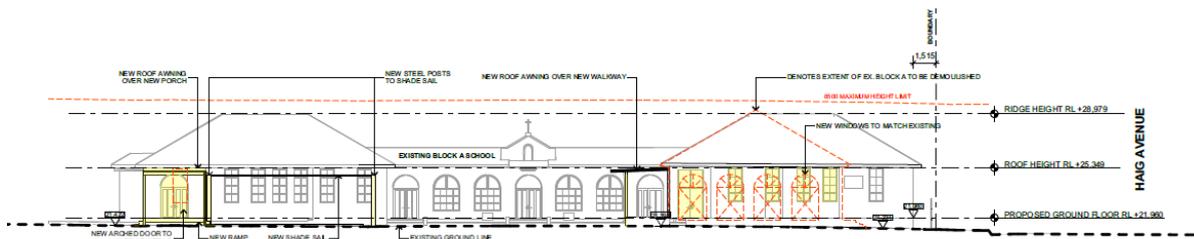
Northern Elevation (Block A) demonstrating changes to existing buildings
